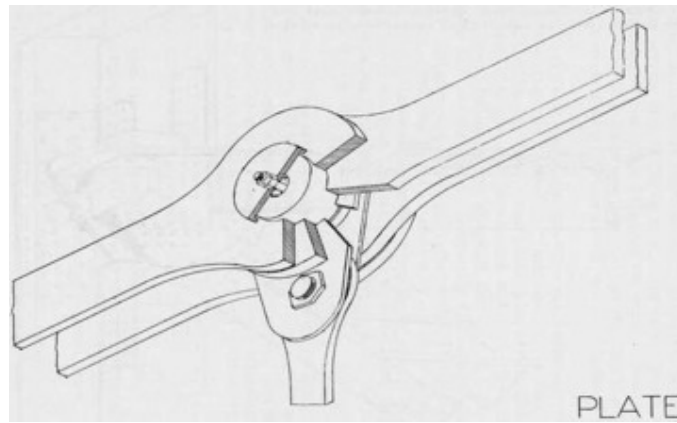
Silver Bridge typical detail (NTSB 1970).
